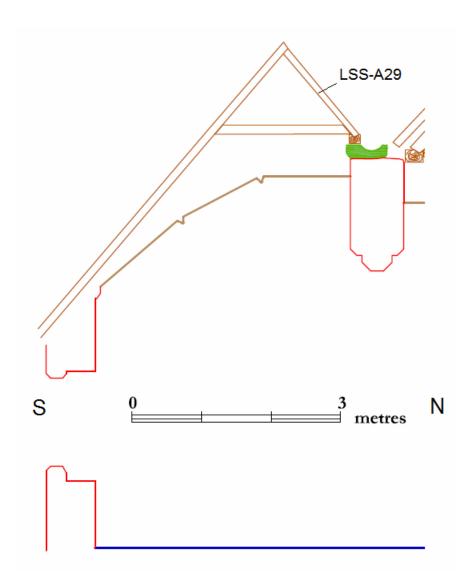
South aisle; frame 8, showing the location of sample LSS-A29 (John Crook)
